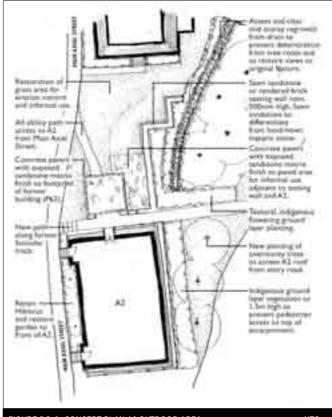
~3 CONCEPT PLAN A2 OUTDOOR AREA
